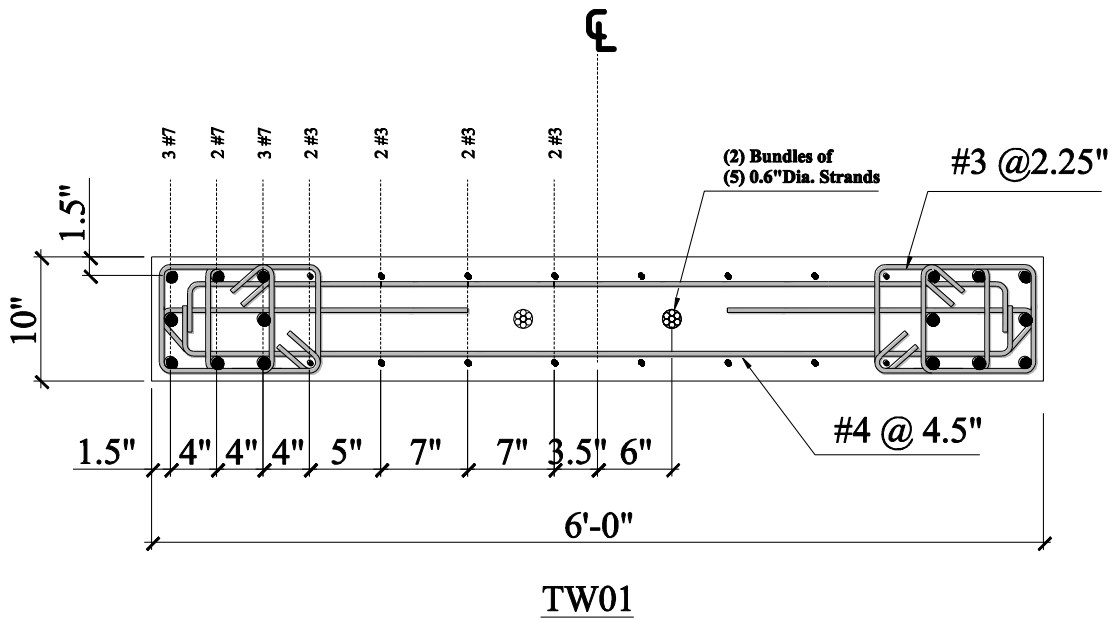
Cross-section view of unbonded PT CIP concrete special structural wall (TW01) (Rivera, 2013)
